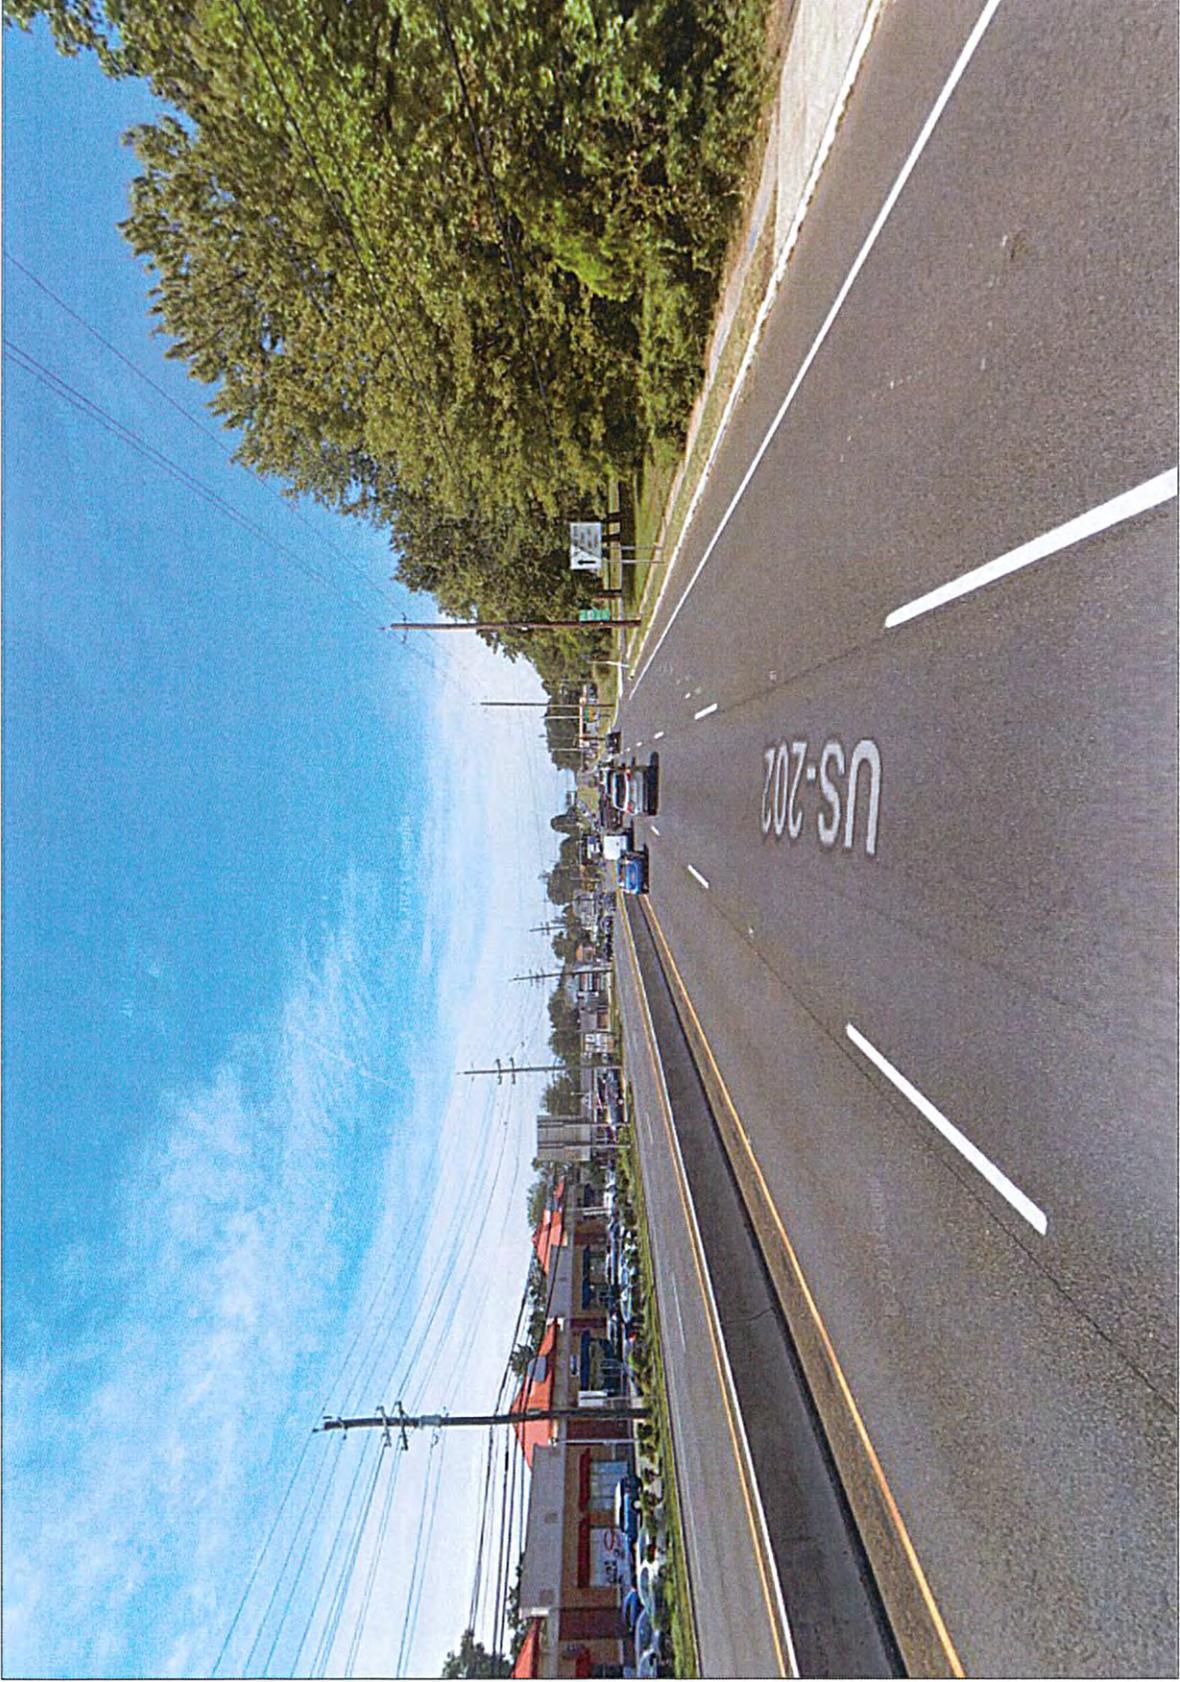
NJSH 202 SB. APPROXIMATELY 400 FEET NORTH OF PROPOSED SIGN
